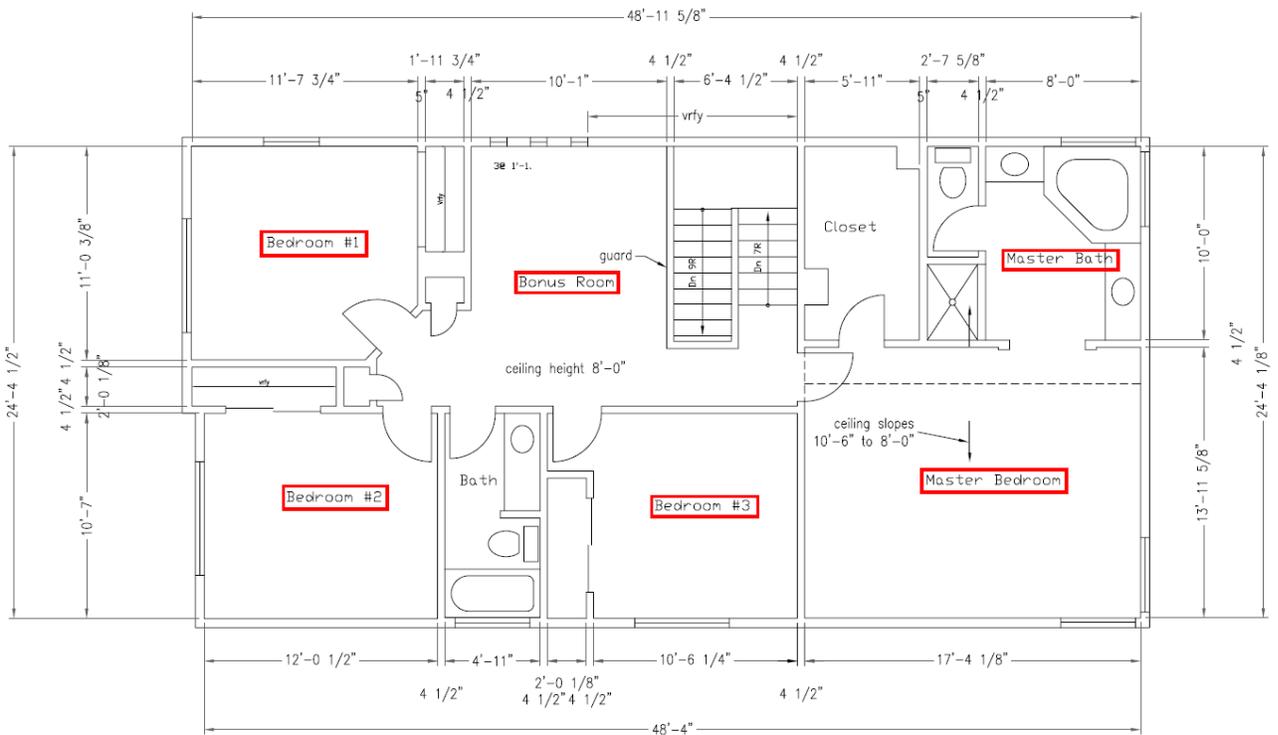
CALEB FLOOR PLAN – UPPER FLOOR
